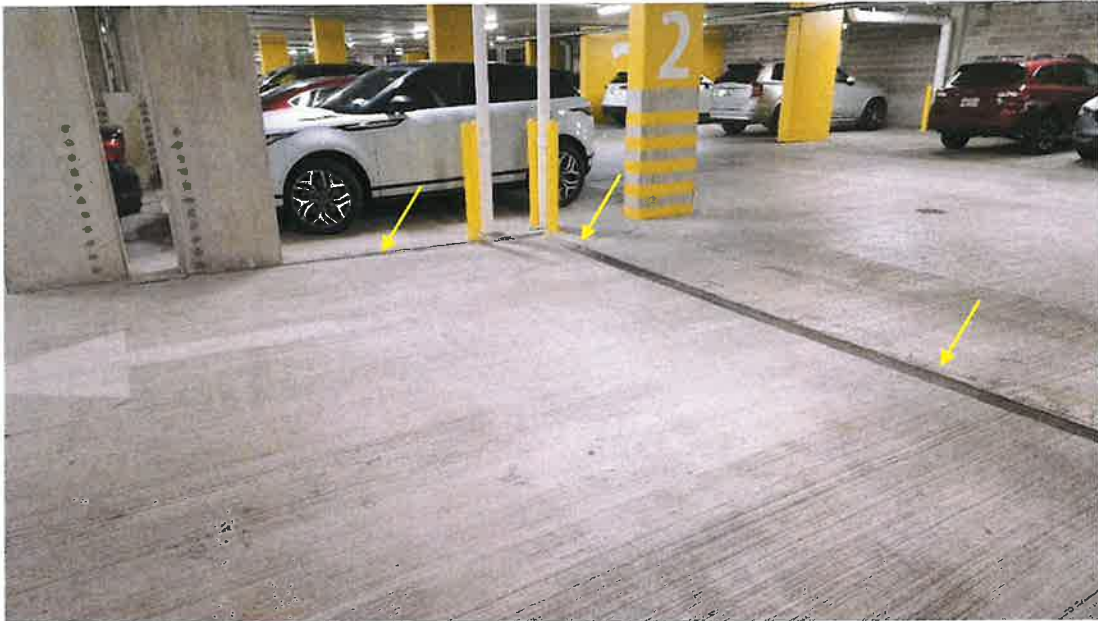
Typical Cantilevered Expansion Joint at North and South of Garage
